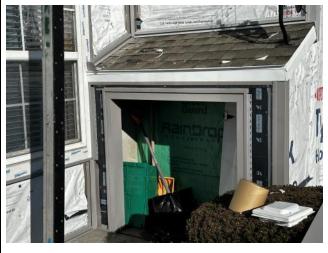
Overview of new metal flashing and flashing tape installed at an exterior shed.
